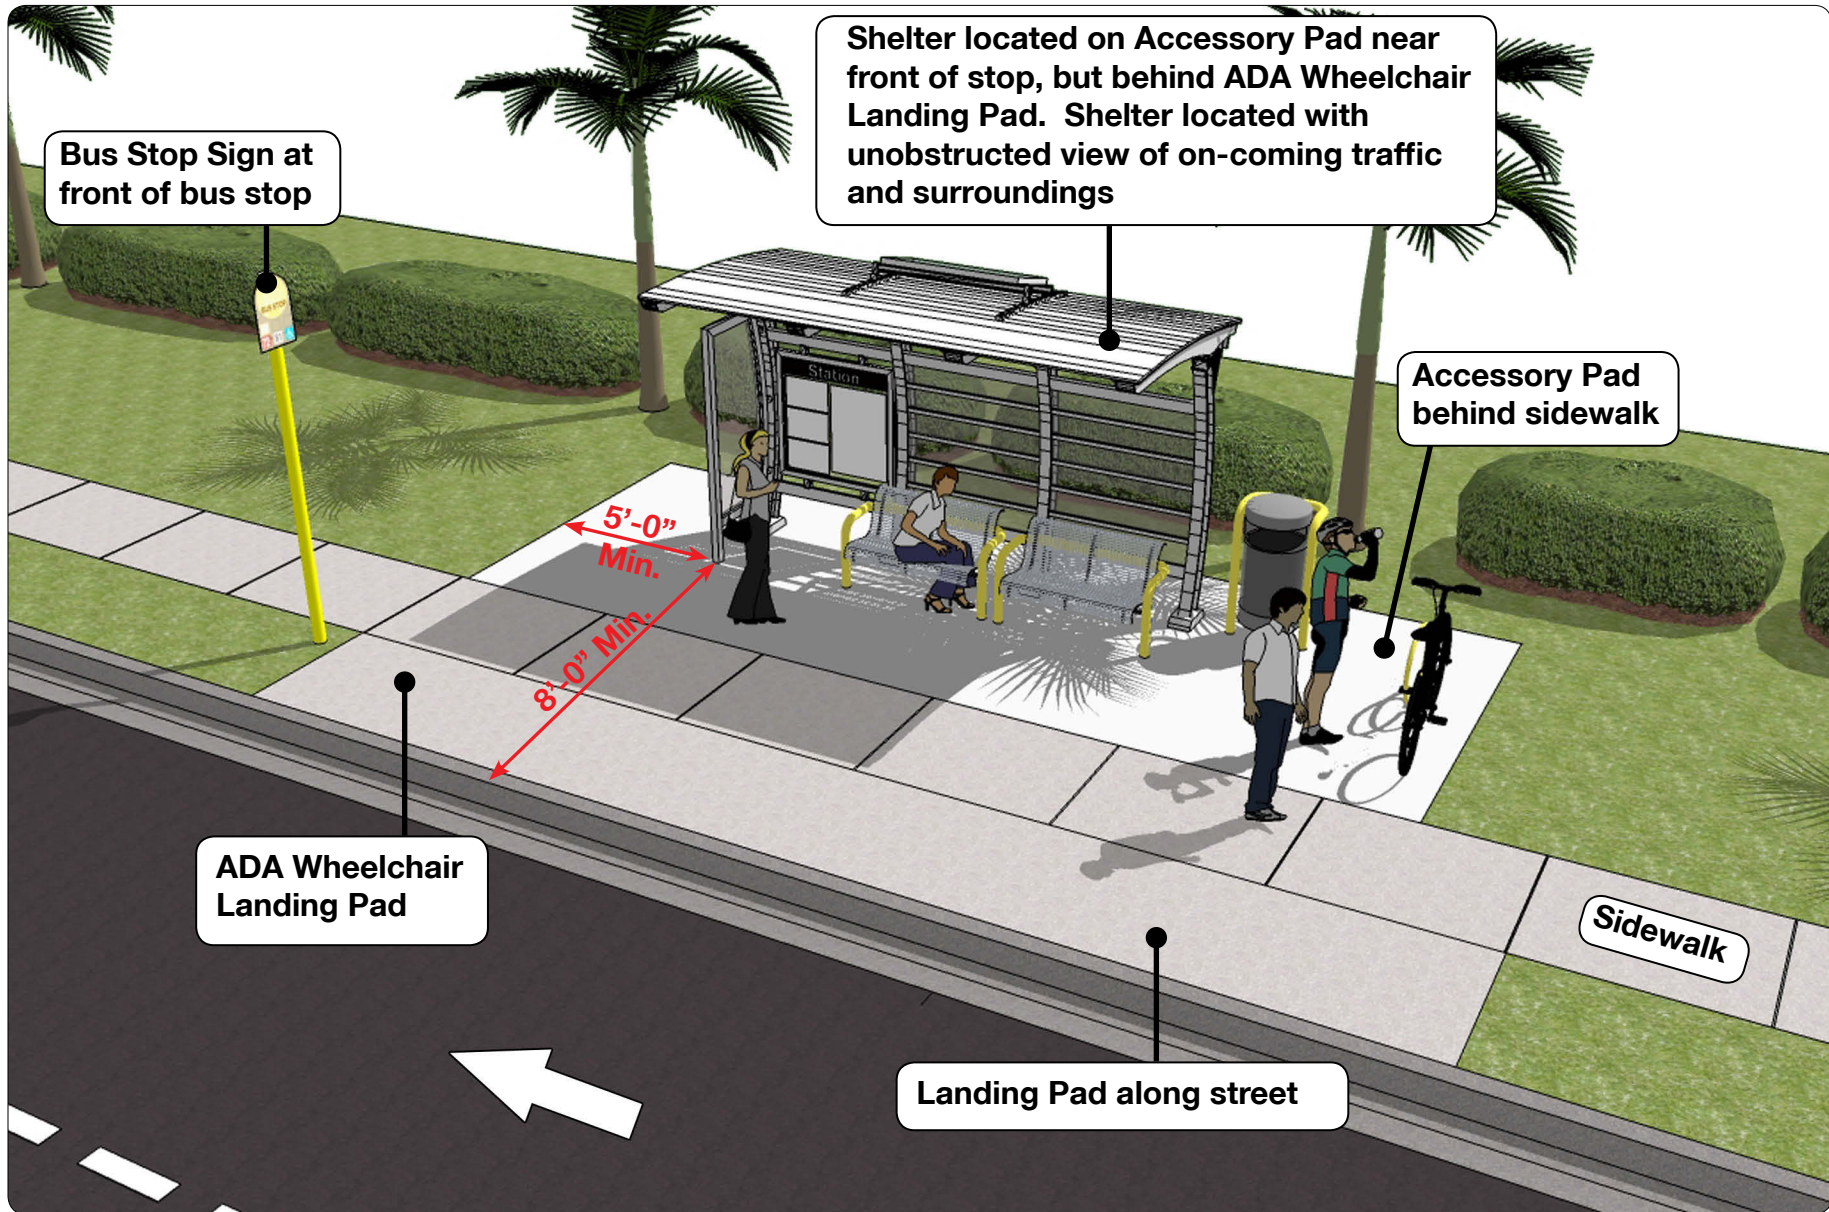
Typical Bus Shelter Layout at a Bus Stop
